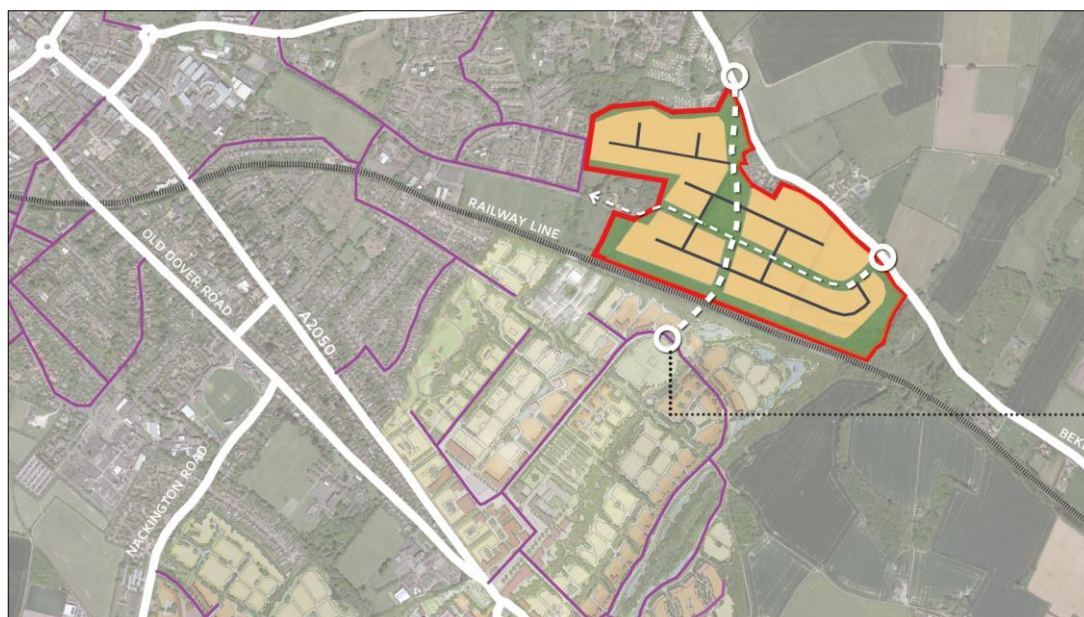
Extract of Illustrative Site Layout Plan (Appendix 1)
